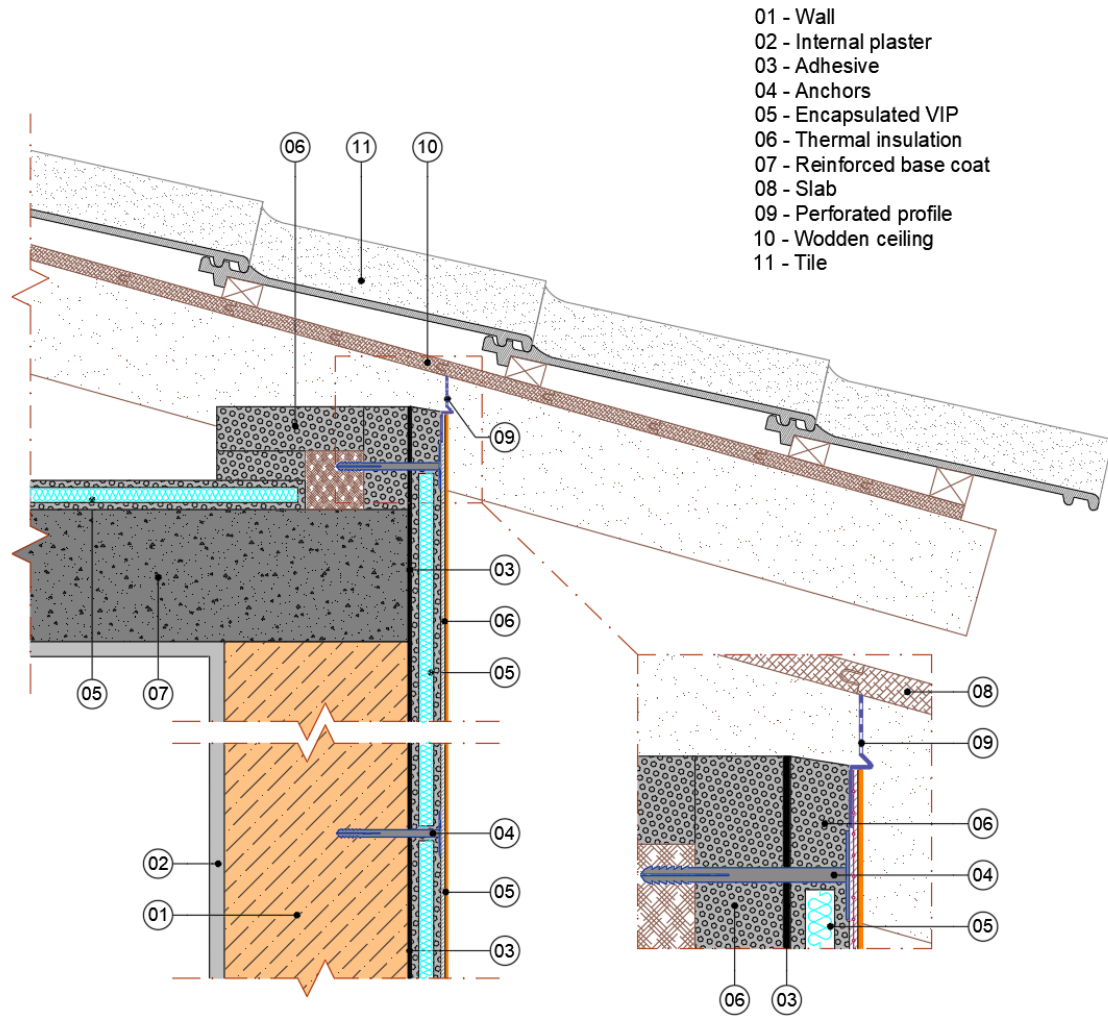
Sectional drawing – connection to back-ventilated roof.
